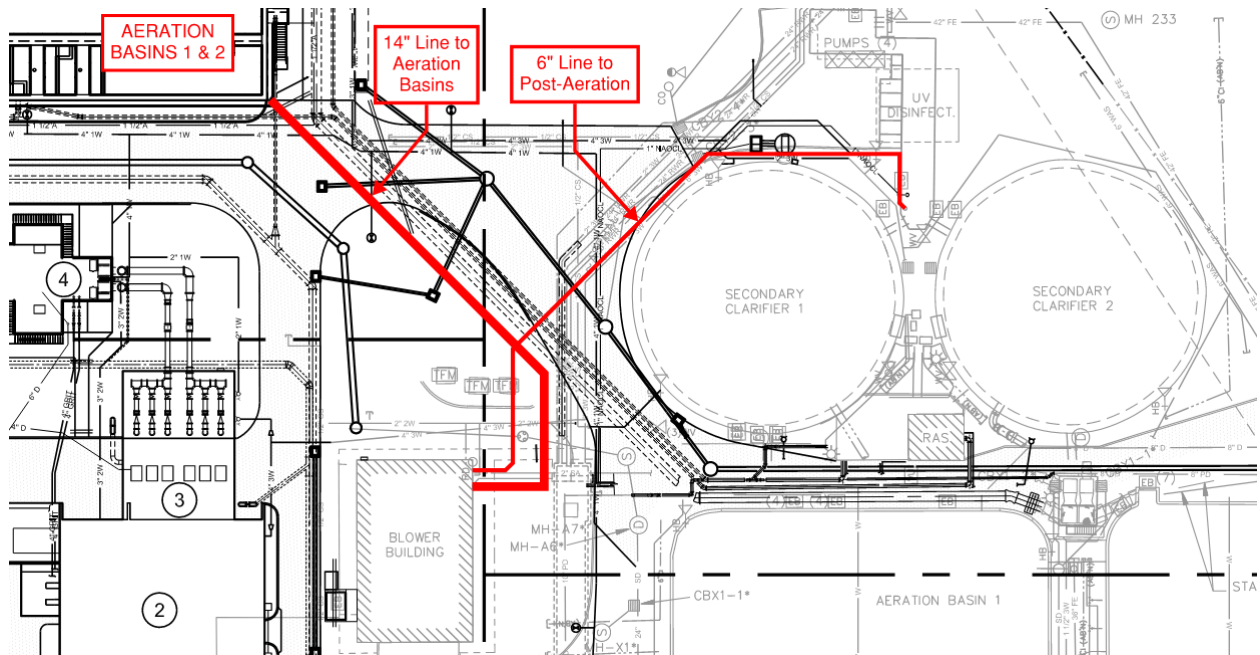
Yard Piping Plan with the Buried Air Distribution Piping Highlighted
